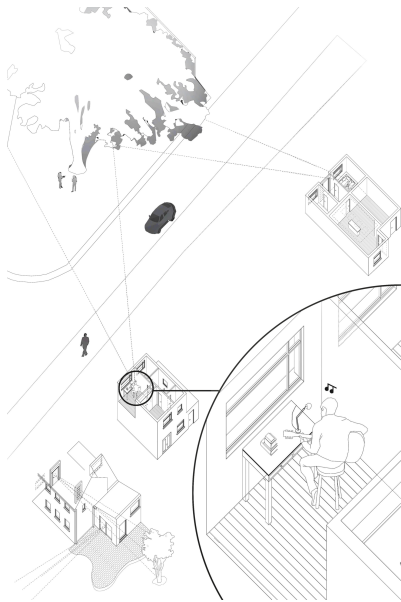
Wider observational drawing regarding views toward nature. Author's own.
